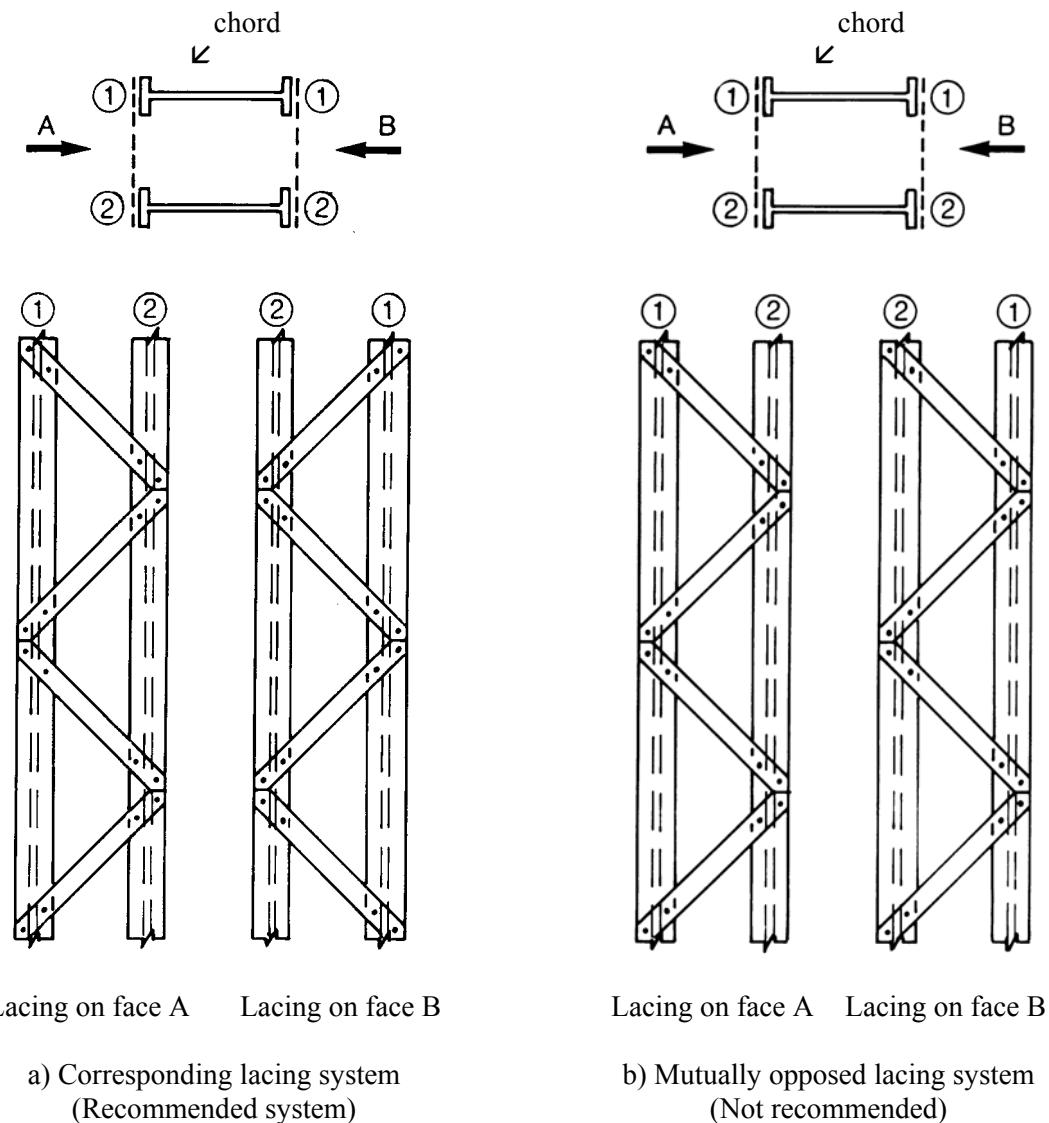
Single lacing system on opposite faces of a built-up member with two parallel laced planes
